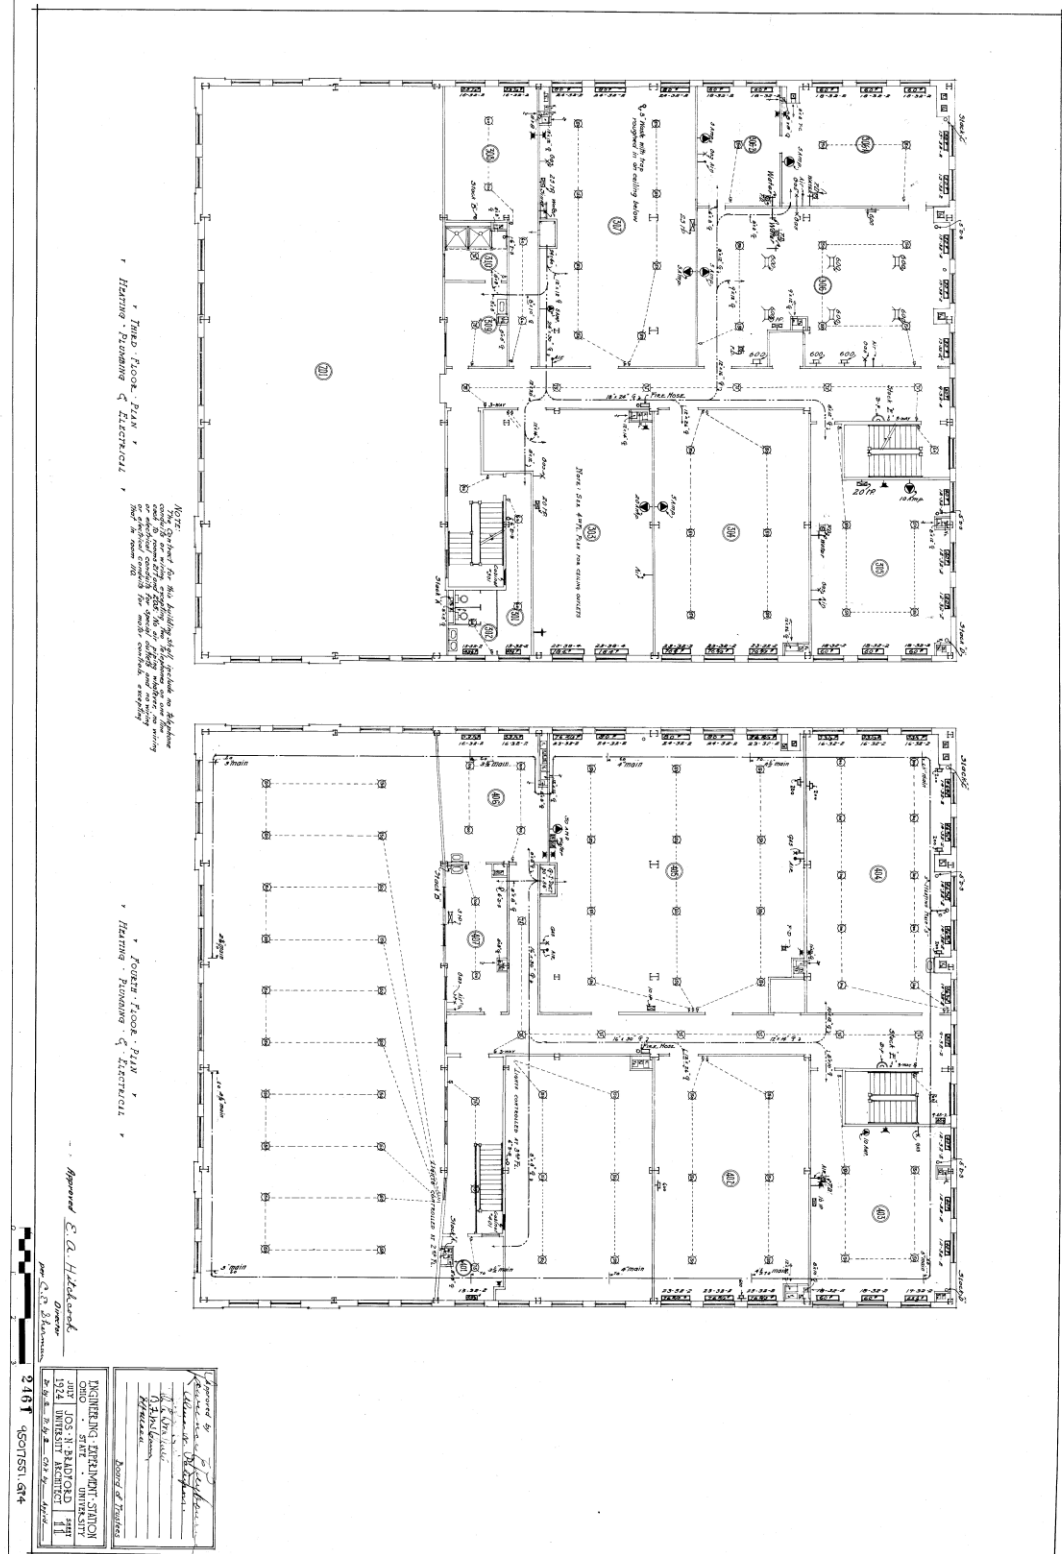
Third and fourth floor heating, plumbing and electrical plans
